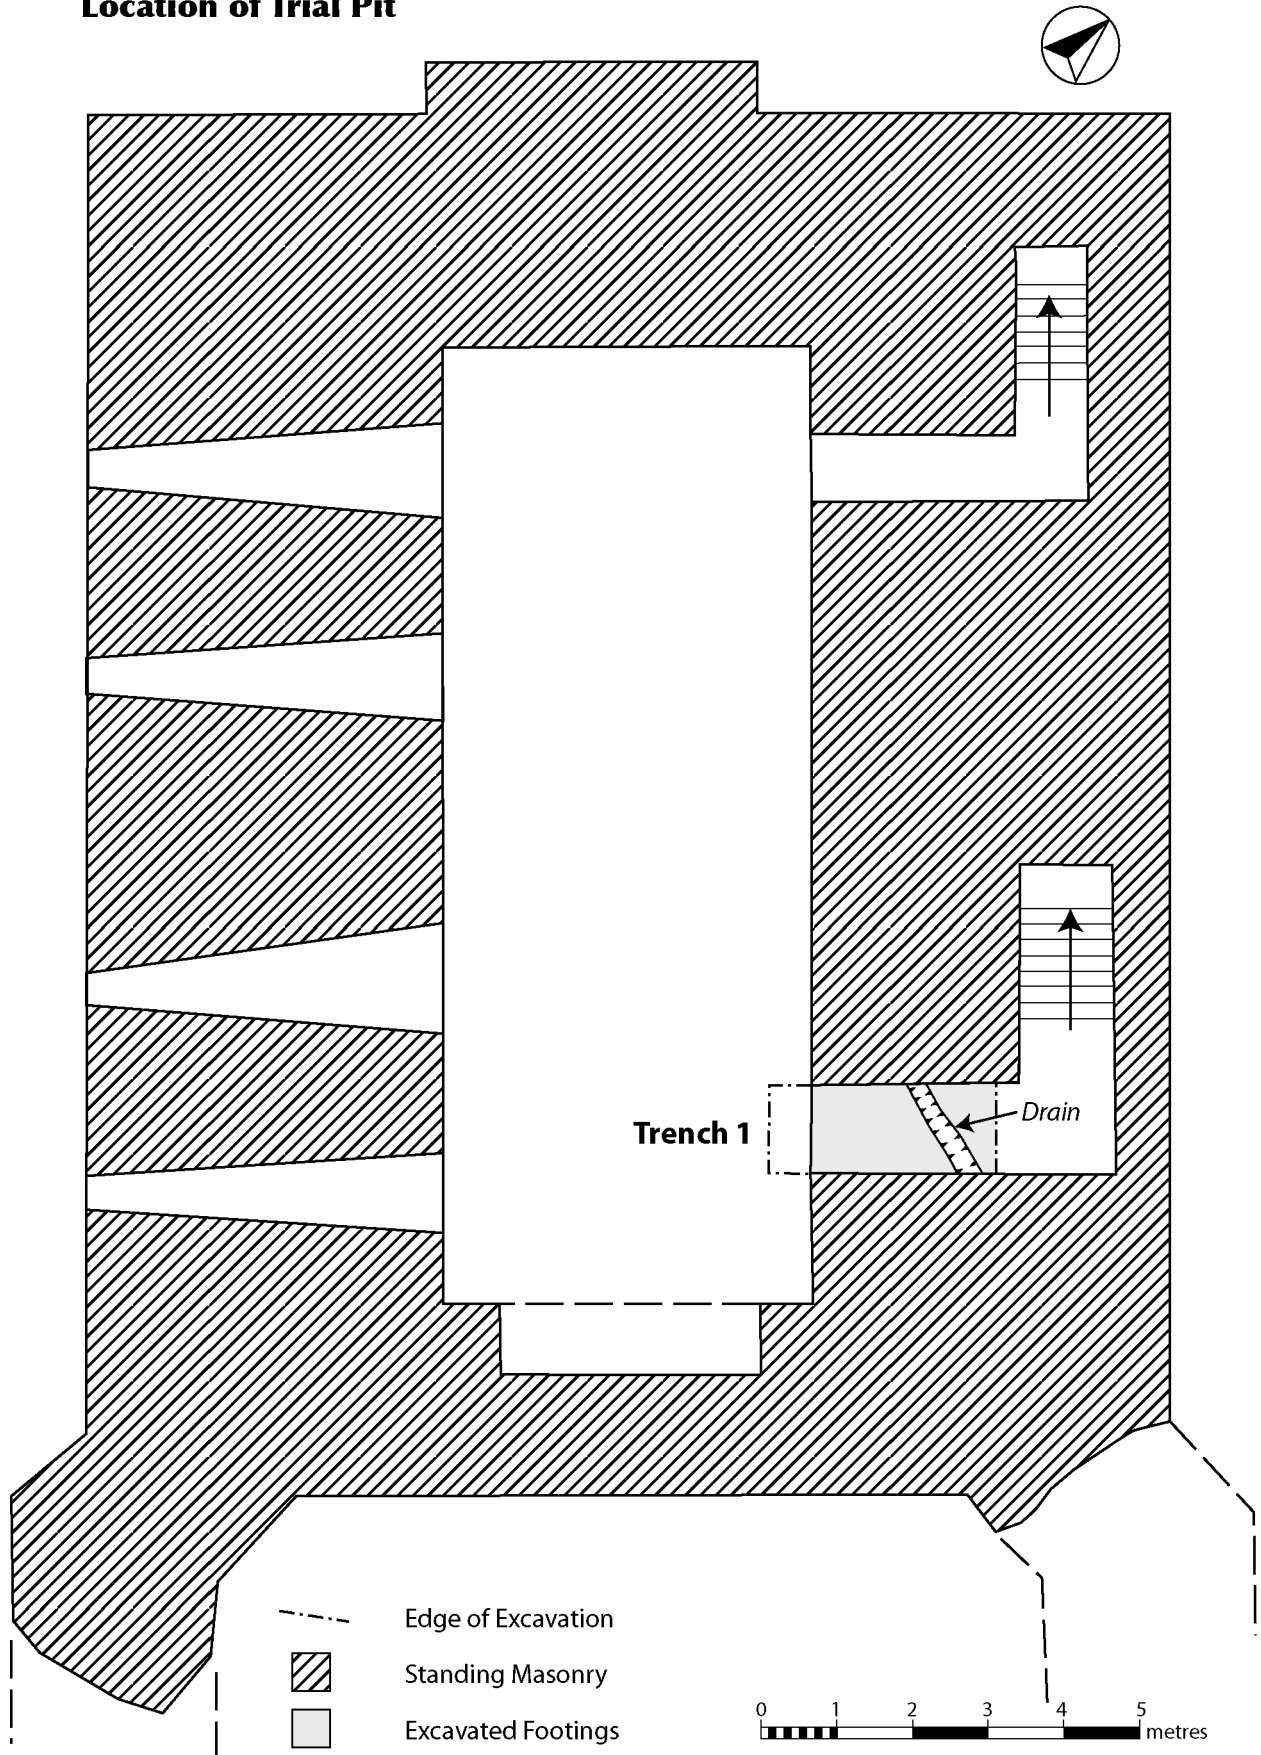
Plan of basement of Sandsfoot Castle and location of Trial Pit (Trench 1).
